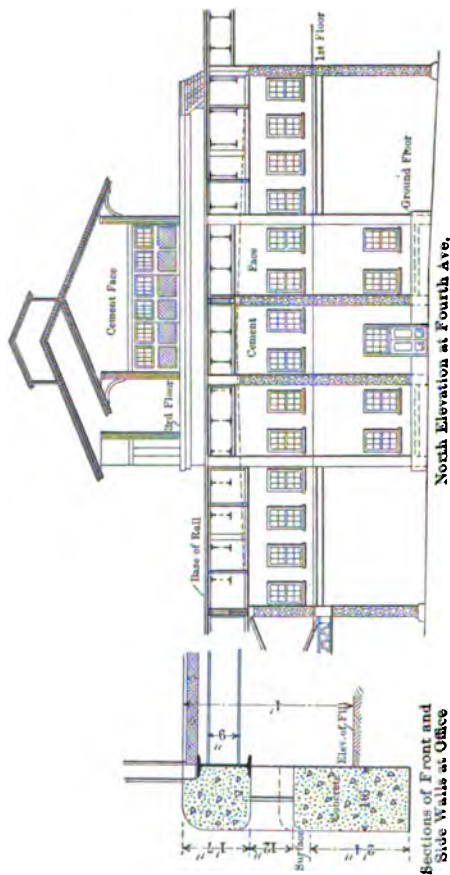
North elevation, freight-house, Pittsburg—Wabash.
